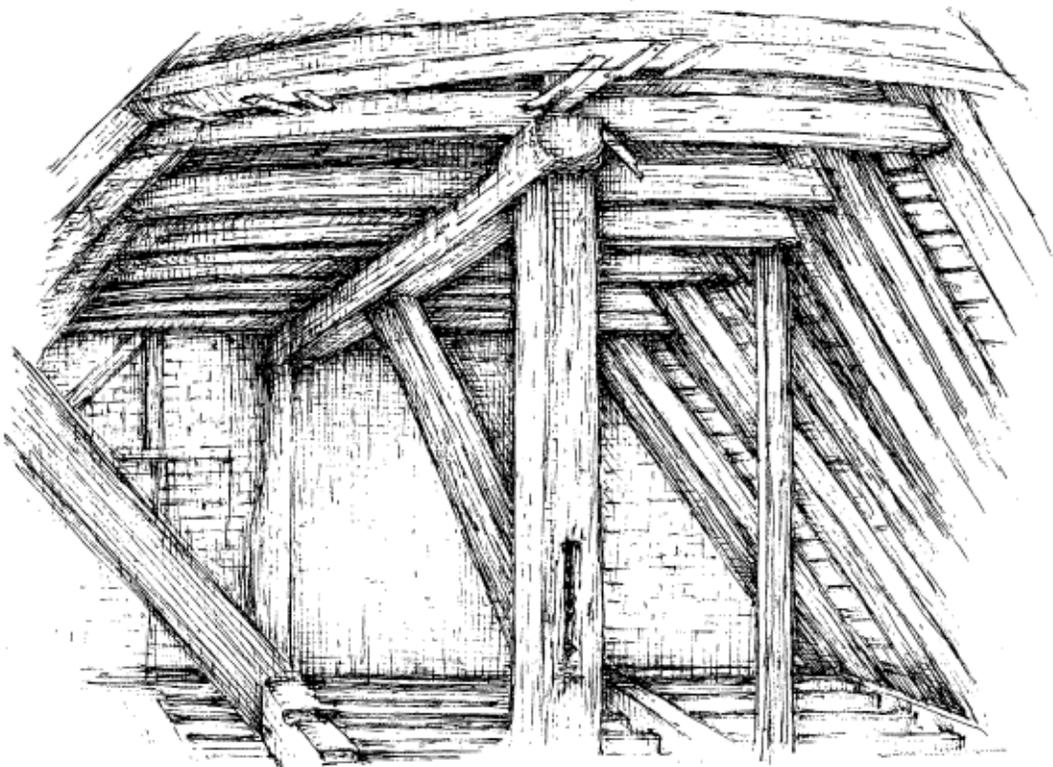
196 High Street, Guildford. Roof timbers (E M Butts)
